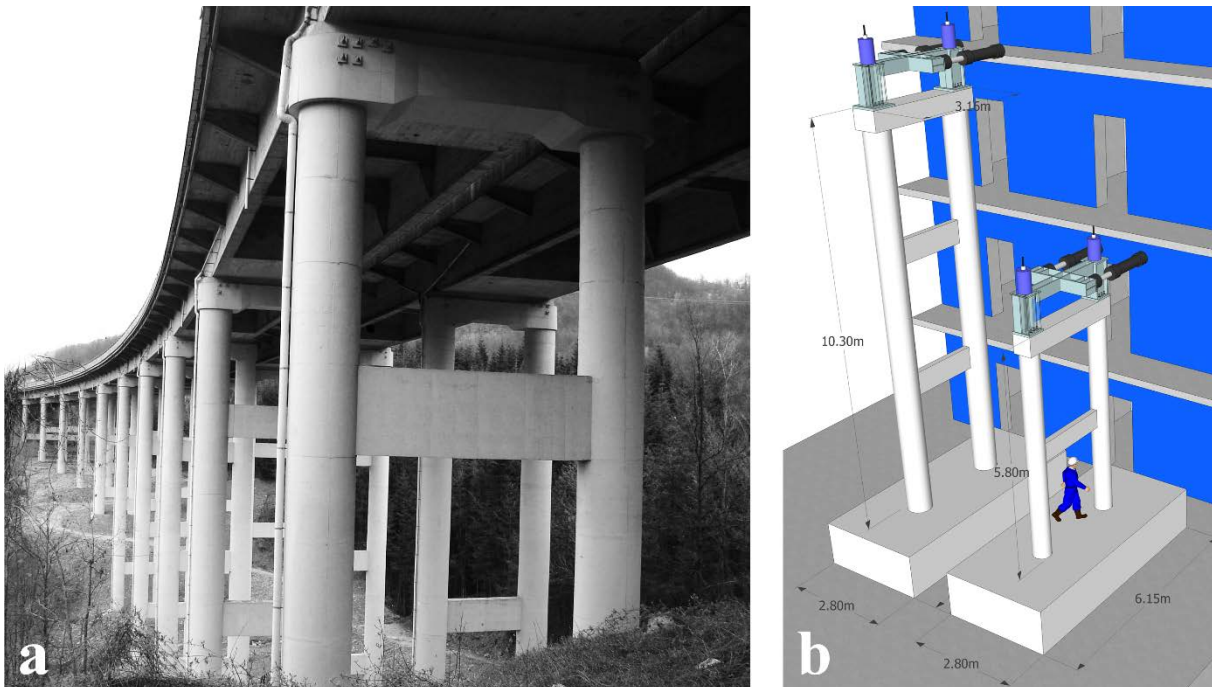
a: Rio-Torto bridge, b: Test set-up of the piers 9 and 11 scaled at 1:2.5 in ELSA
